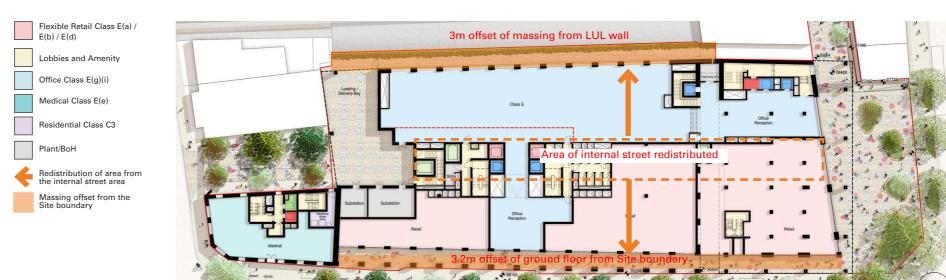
Design Responses to QRP 2 - Illustrative Ground Floor Plan
